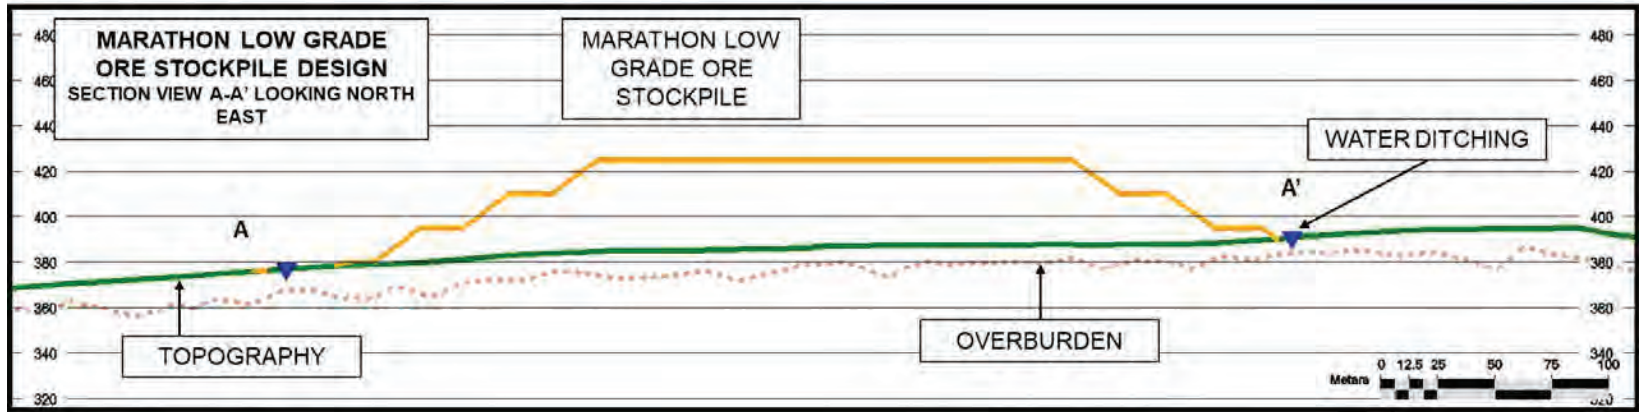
Marathon Low-grade Ore Stockpile Design – Section View A-A' Looking Northeast
